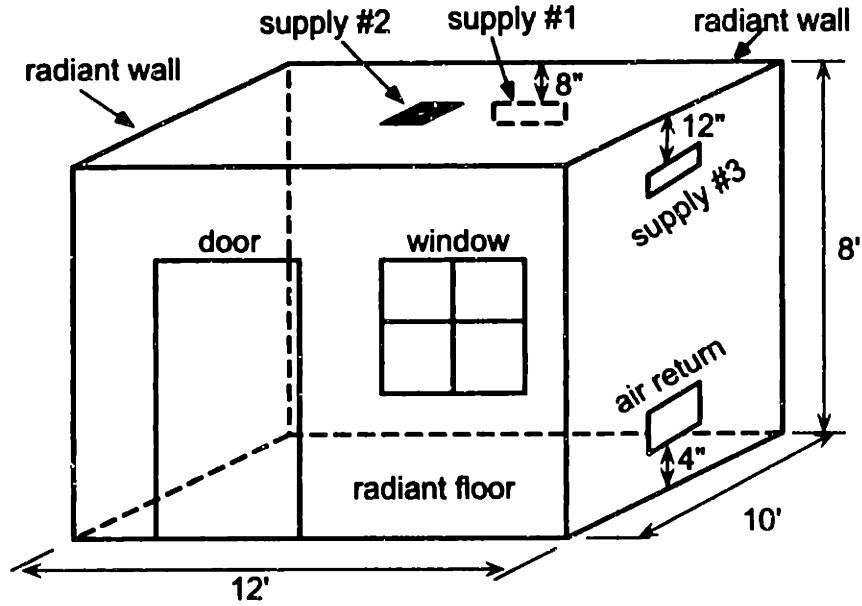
Dimensions of the HVAC test chamber. The dimensions of the air diffusers are listed in Table A.1.
